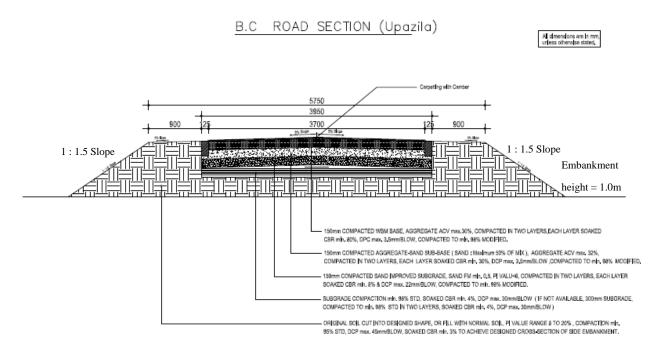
B.C Road Section (Non-submerged) (Upazila Road)
